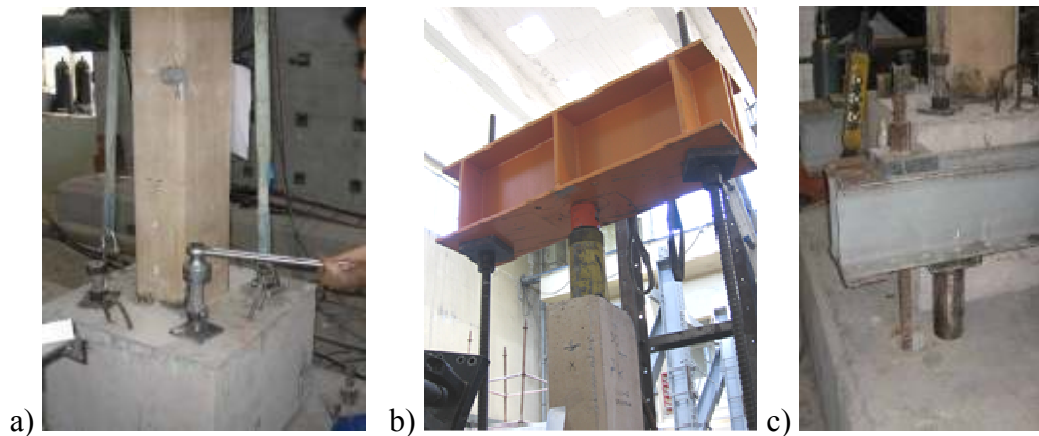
Preparation of specimen for the test: (a) Maintaining the specimen to the adaptor footing, (b) Axial load setup, (c) Placement of post tensioning tendons.
